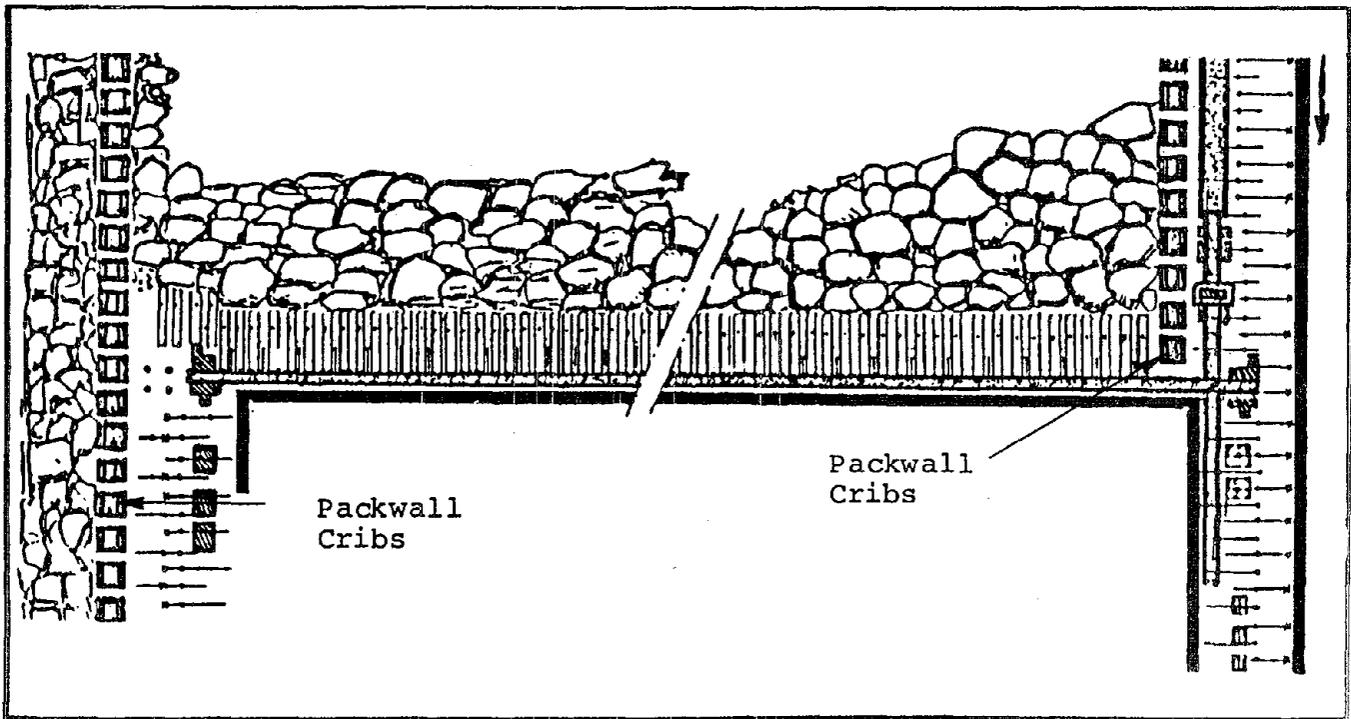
Longwall Face Layout Utilizing Packwalls
